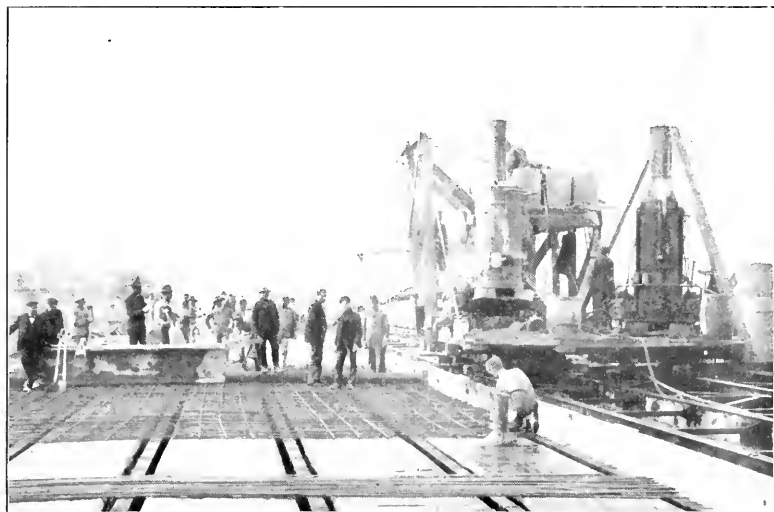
ARRANGEMENT OF CONCRETE PLANT FOR LAYING FLOOR
